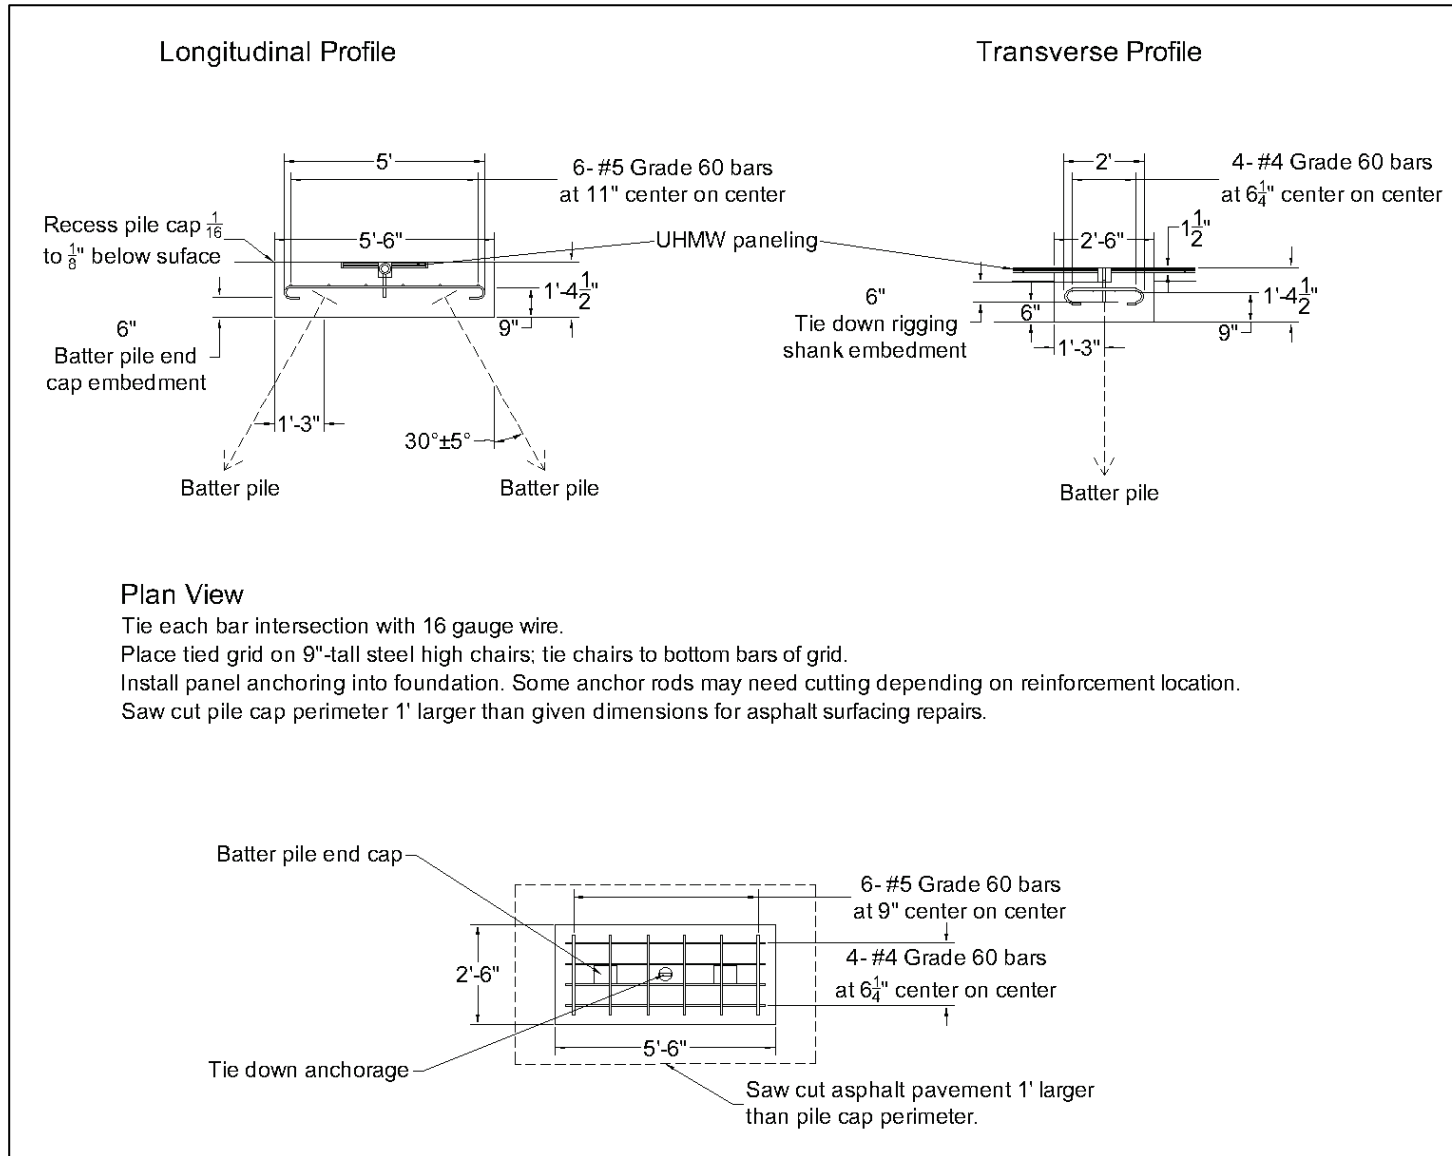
Pile cap dimensions and reinforcement layout for tie-down anchoring.
